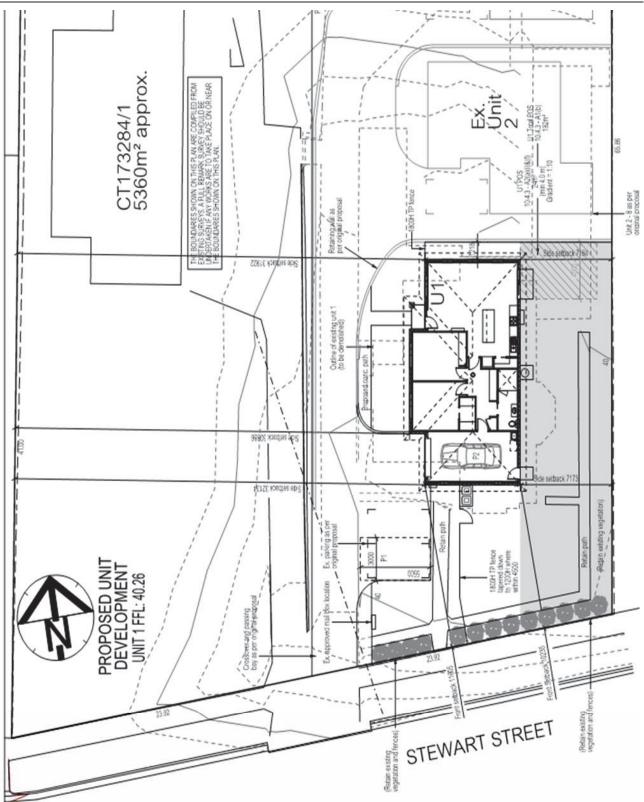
Partial site plan showing outline of existing building overlayed by proposed unit
